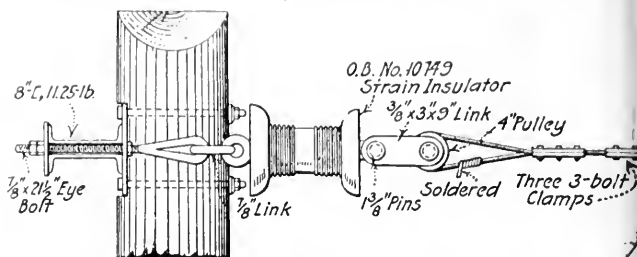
METHOD OF DEAD-ENDING 5/16-IN. STEEL STRAND SUPPORTED FROM TOWER SHOWN IN FIG. 7
